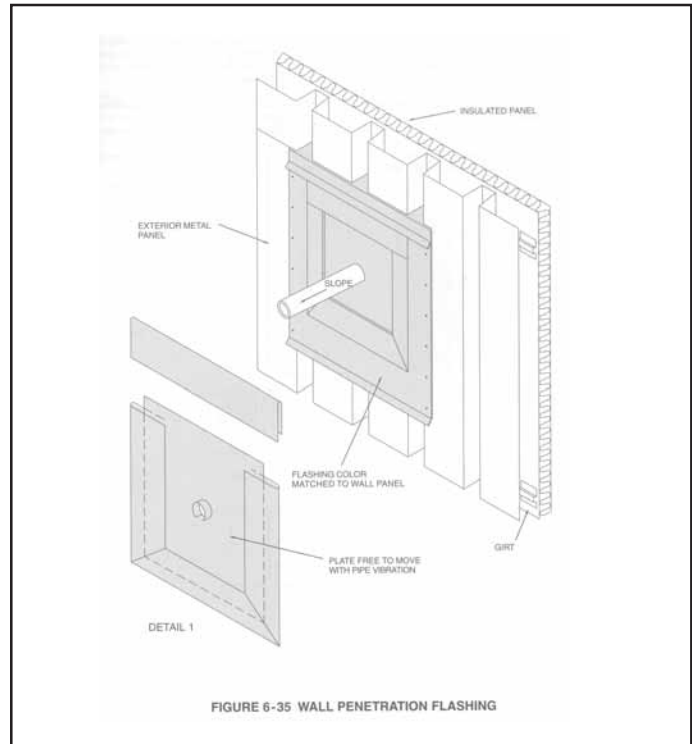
through 6-38 illustrate flashing approaches for a variety of elements penetrating metal wall. Elements of these details can be altered and adapted to other types of wall constructions or other elements that penetrate a wall.
